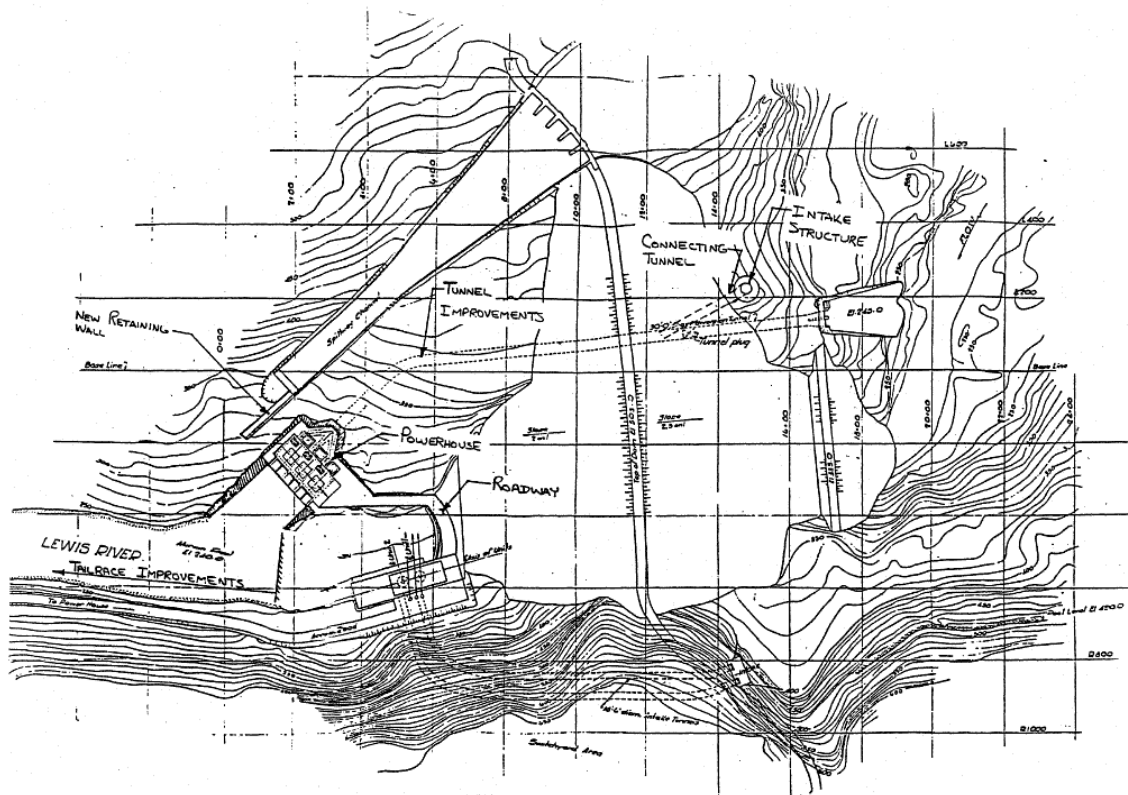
Yale Merwin Pumped Storage Site Layout (Black and Veatch)
